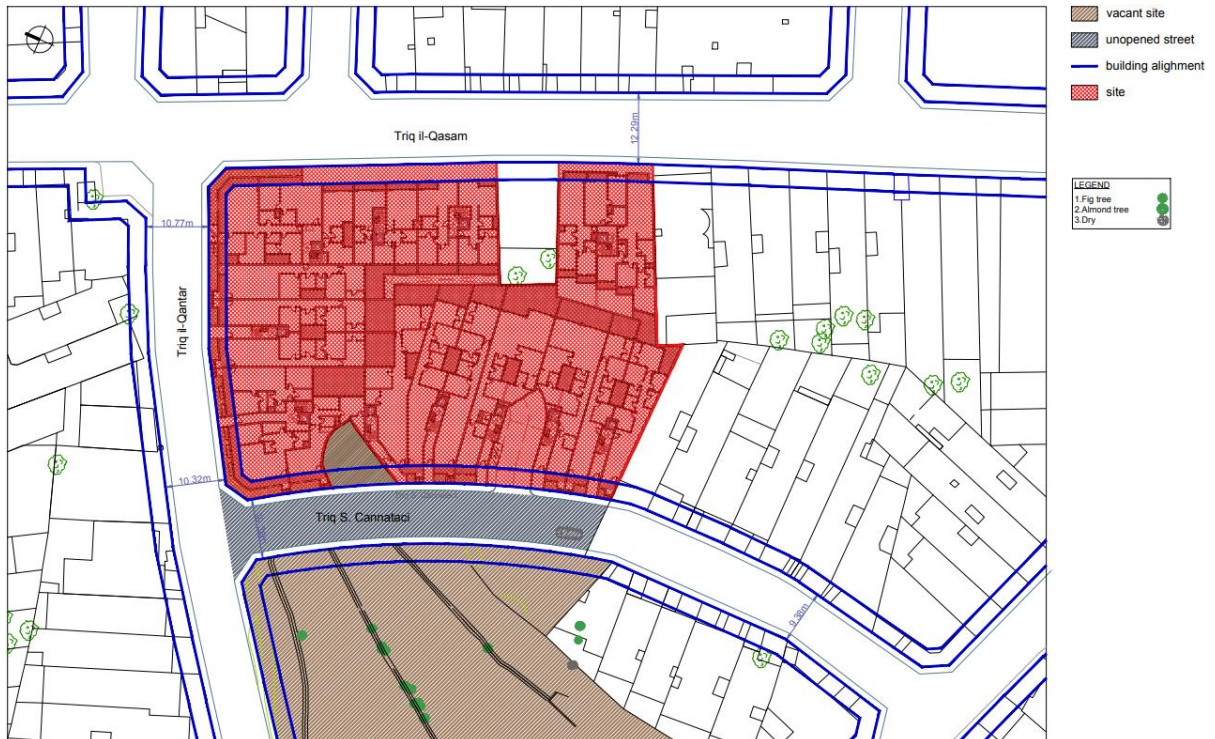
Proposed block plan (Source: EApps document PA/00650/20 – 129i)
